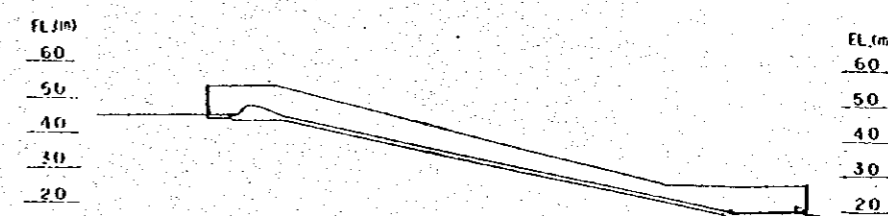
Alternative Plan (Concrete Facing Type Rock Fill Dam)
